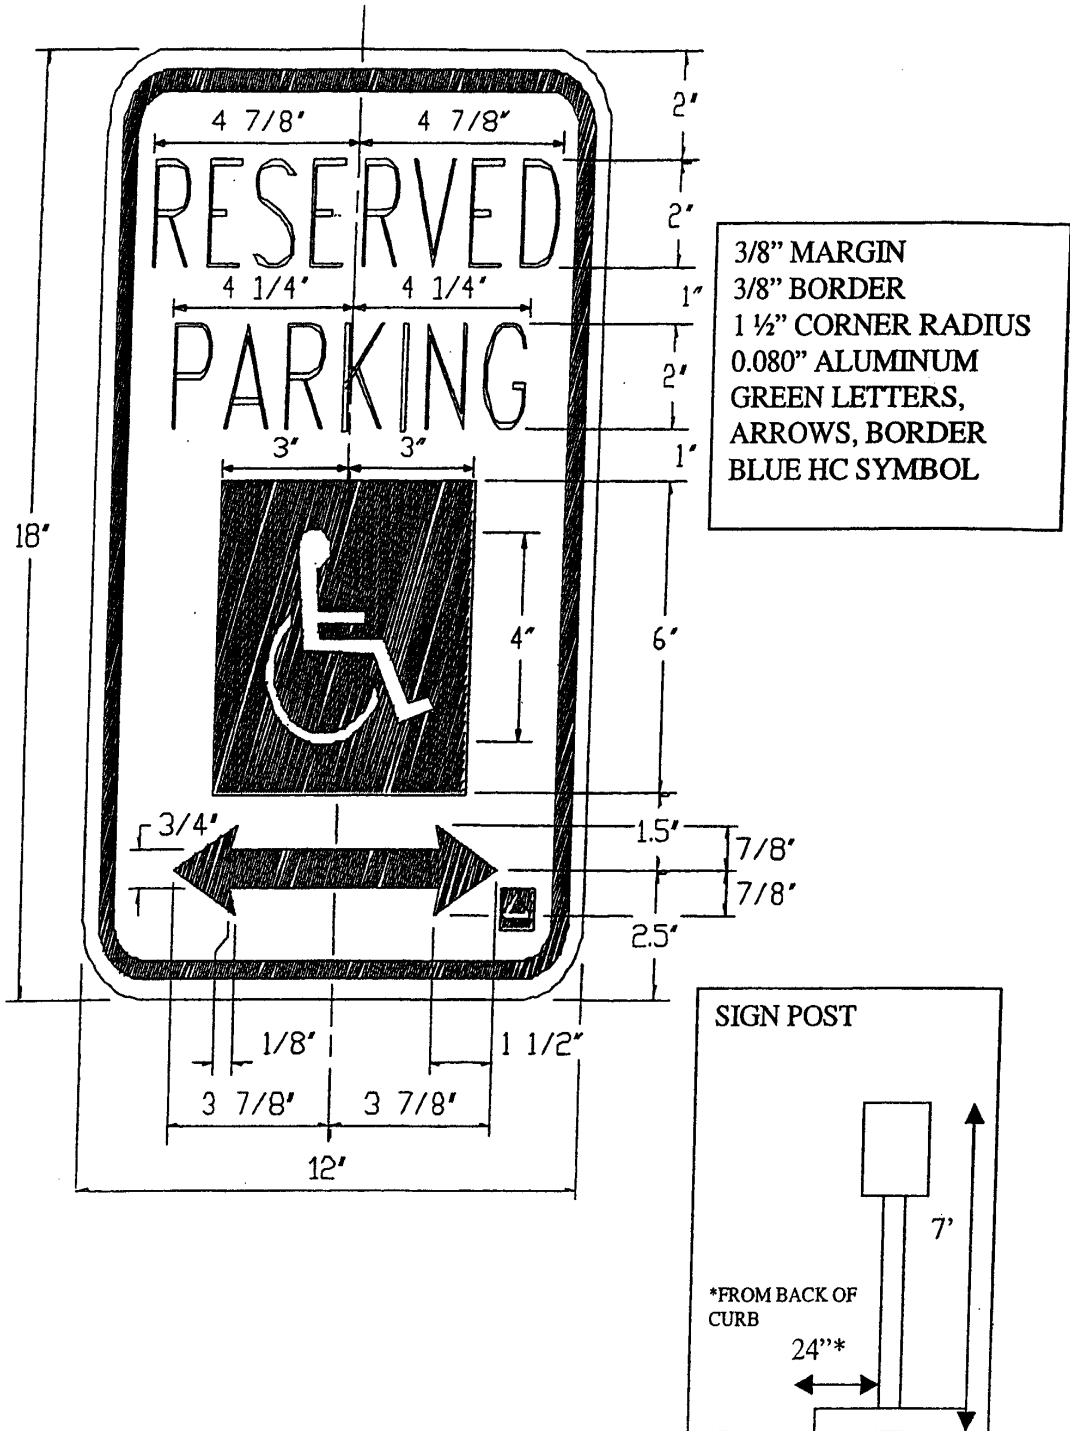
HANDICAPPED SIGN LOCATIONS AND STALL
